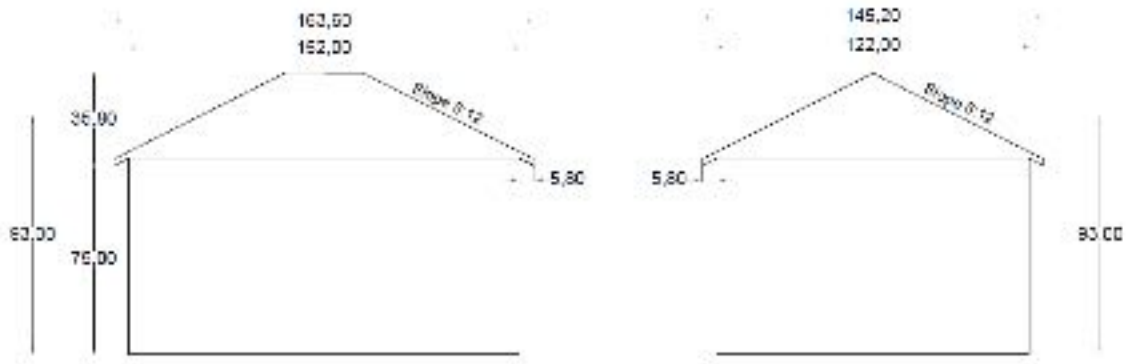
8: Model G layout (a) Elevation View (b) Side View (all dimensions are at model-scale in cm)
